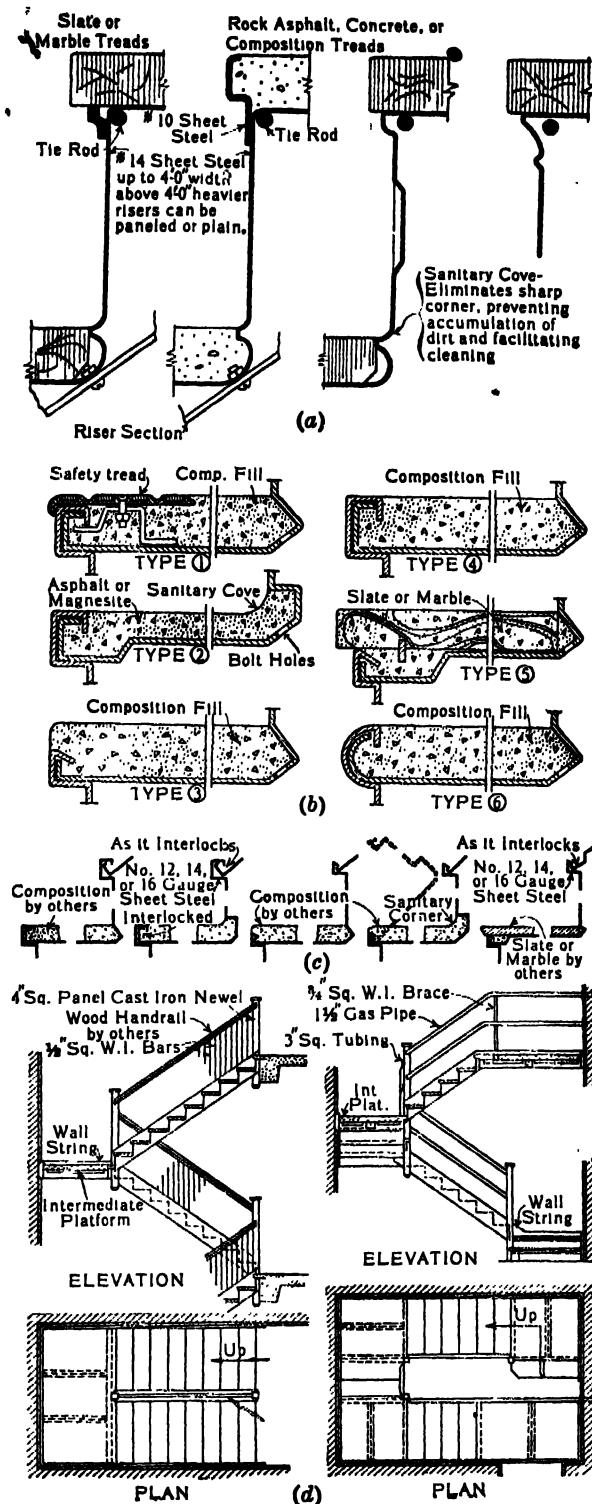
STEEL SUB-TREAD AND RISER STAIRS
